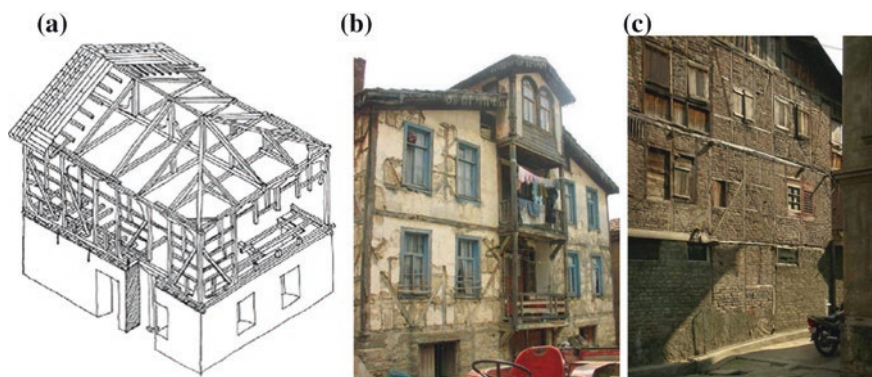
Some examples of timber frame buildings, a typical house of Lefkas island in Greece, built with the local aseismic technique [7], b in Turkey—hatil at ground floor and himis in upper storeys [8], c India—dhajji-dewari building in Kashmir [2]
